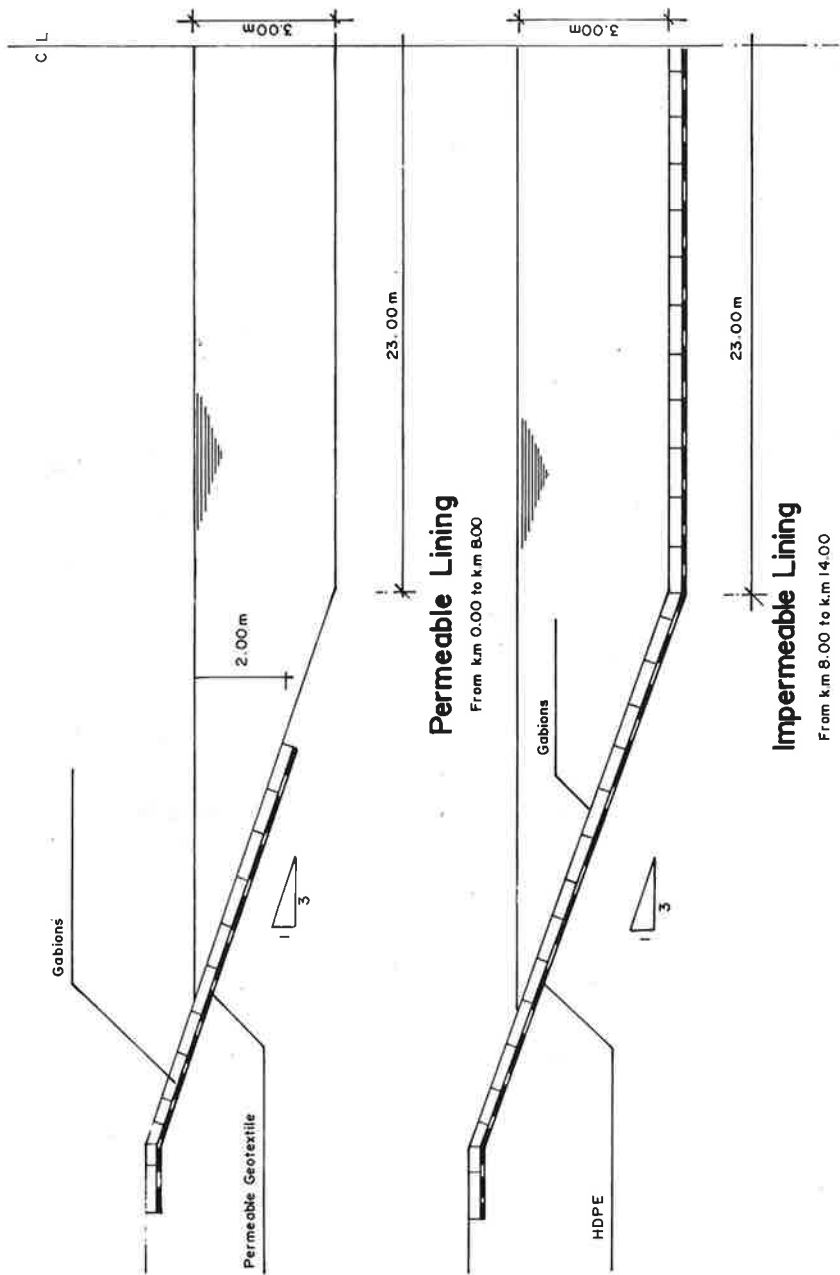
Typical Sections Showing Permeable and Impermeable Linings.
